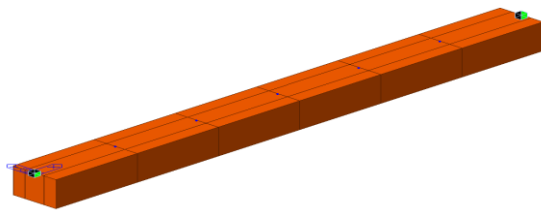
MIDAS model for Case 5-B4: Beam with Concrete Jacketing, External Prestressing and Minimum Reinforcement
